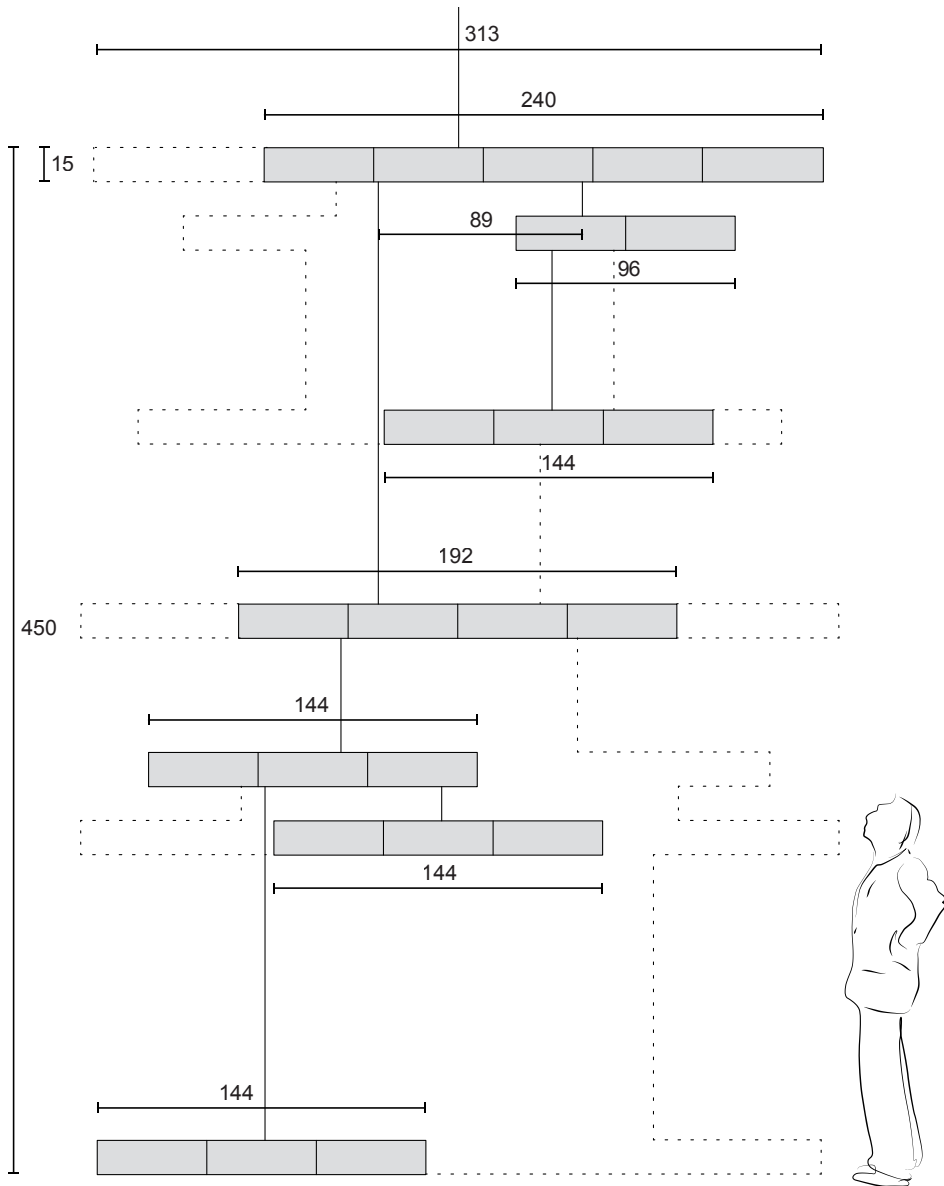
Dimensions of the final layout of concrete mobile *Stable Equilibrium*; dashed lines are framing the enveloped space filled [cm]
